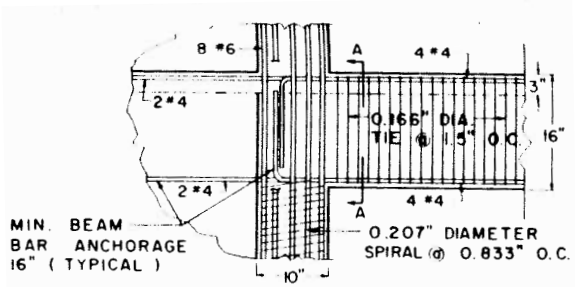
Wall pier reinforcement detail (Ozselcuk, 1989)
